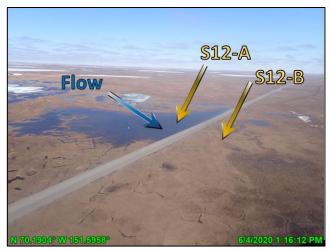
Ponding near S12 behind blocked culverts, looking east; June 4, 2020
